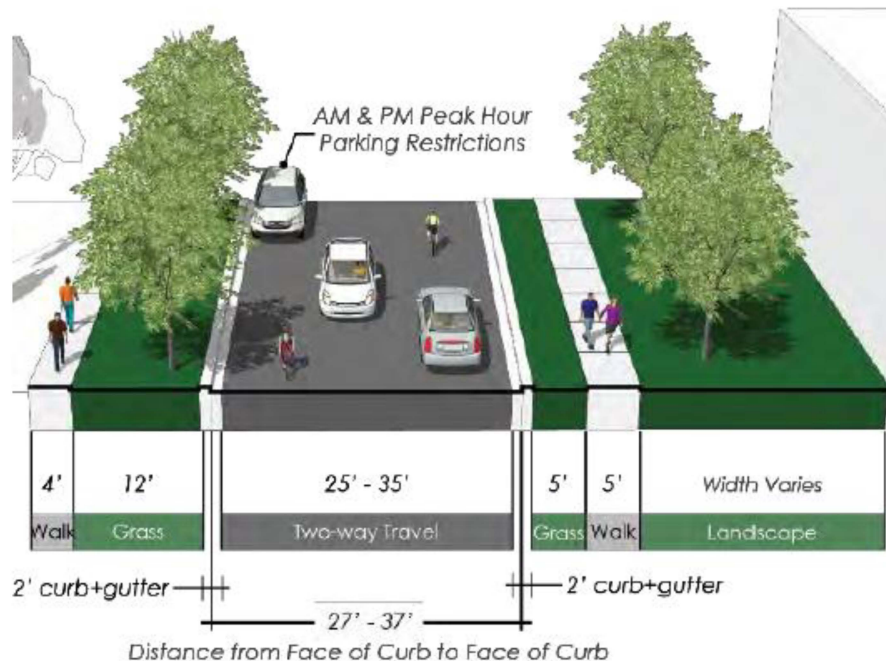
Existing Section – Cheltenham Drive from Alley to Tilbury Street (Facing East)
